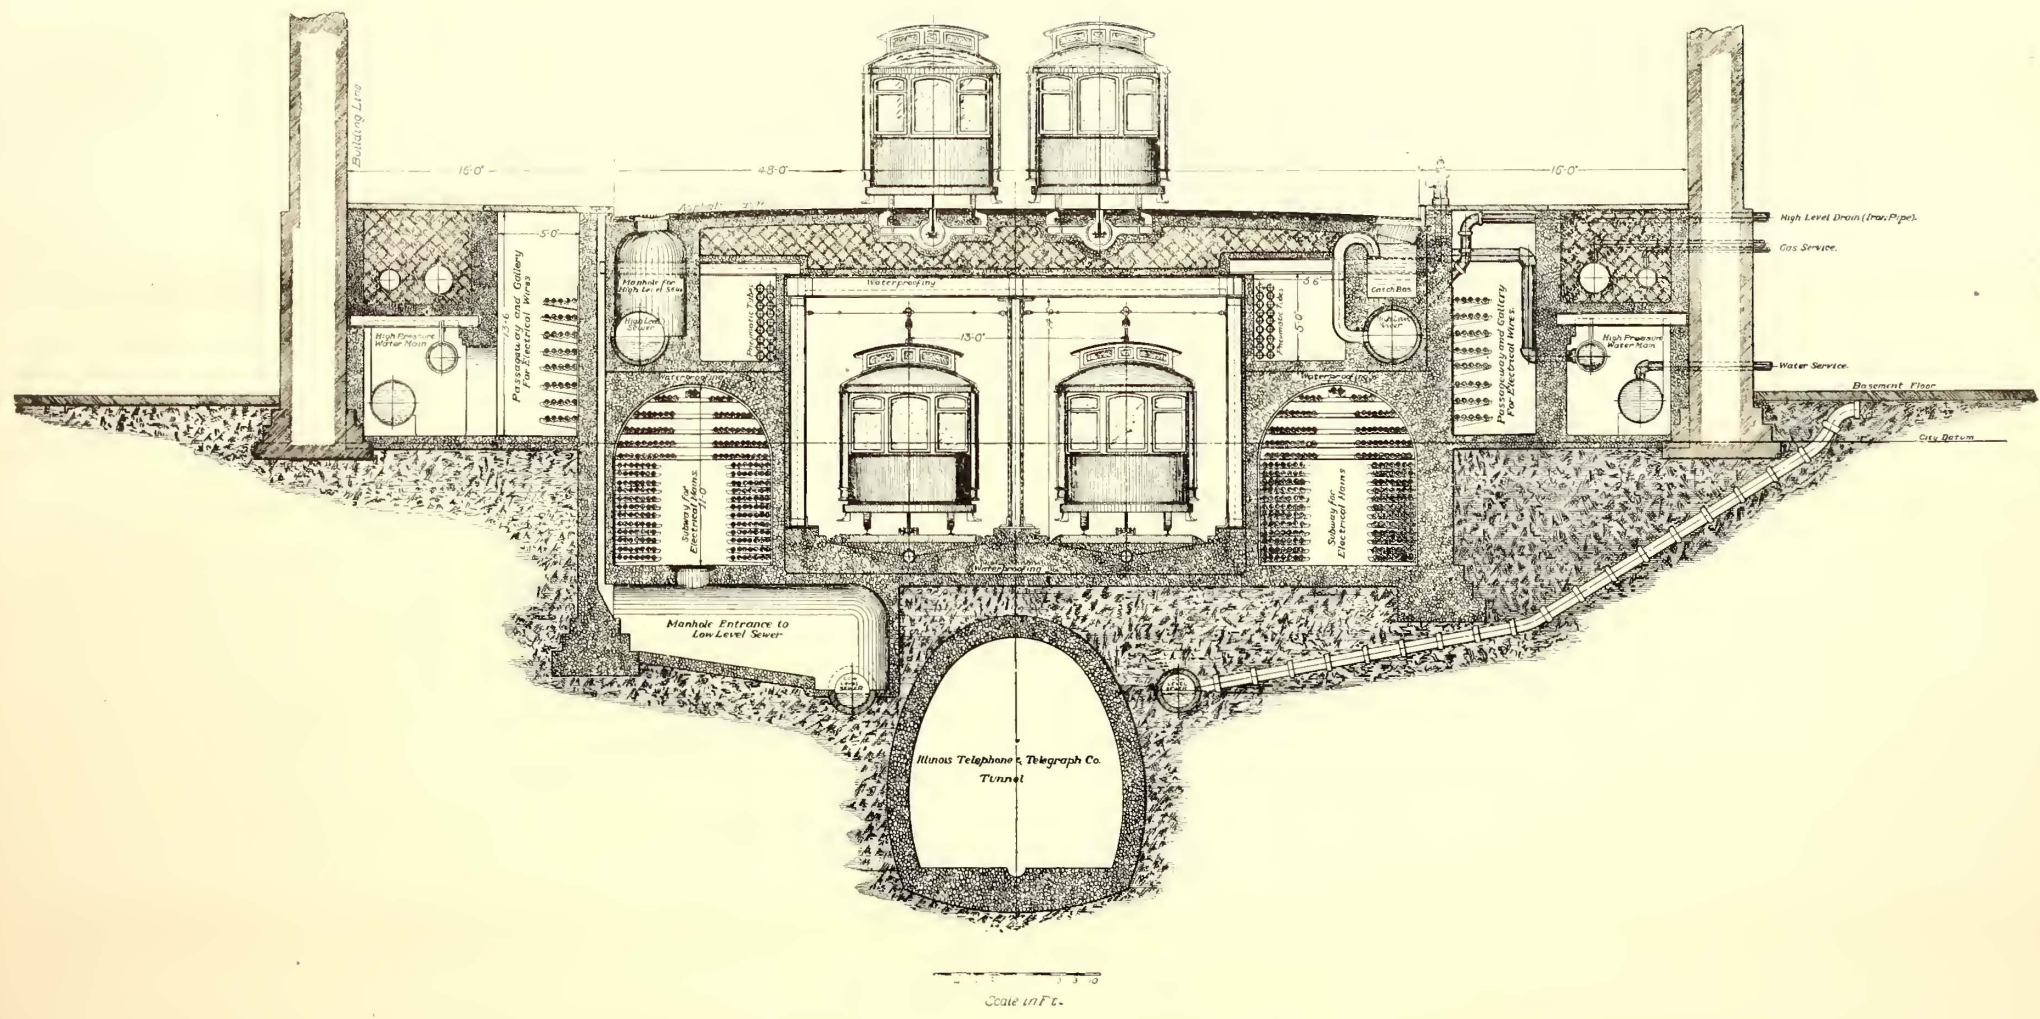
TYPICAL CROSS-SECTION BETWEEN STATIONS FOR PROPOSED STREET RAILWAY SUBWAY OVER LARGE TUNNEL OF ILLINOIS TELEPHONE & TELEGRAPH COMPANY ON STREET 80 FEET WIDE
